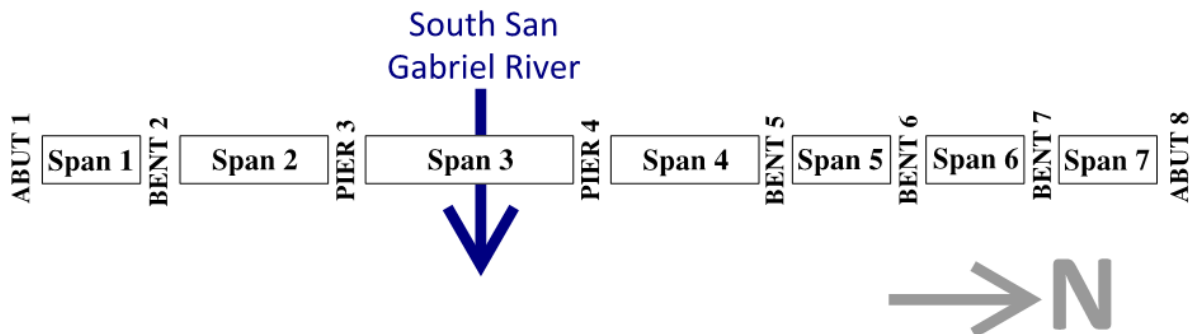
Schematic orientation of South Austin Avenue Bridge; Span 3 includes a 56-foot suspended span between 14-1/2-foot cantilevered extensions from Spans 2 and 4.
